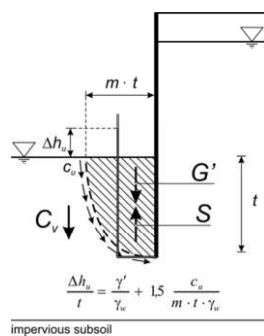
Hydraulic heave as wedge failure (Wudtke and Witt)
